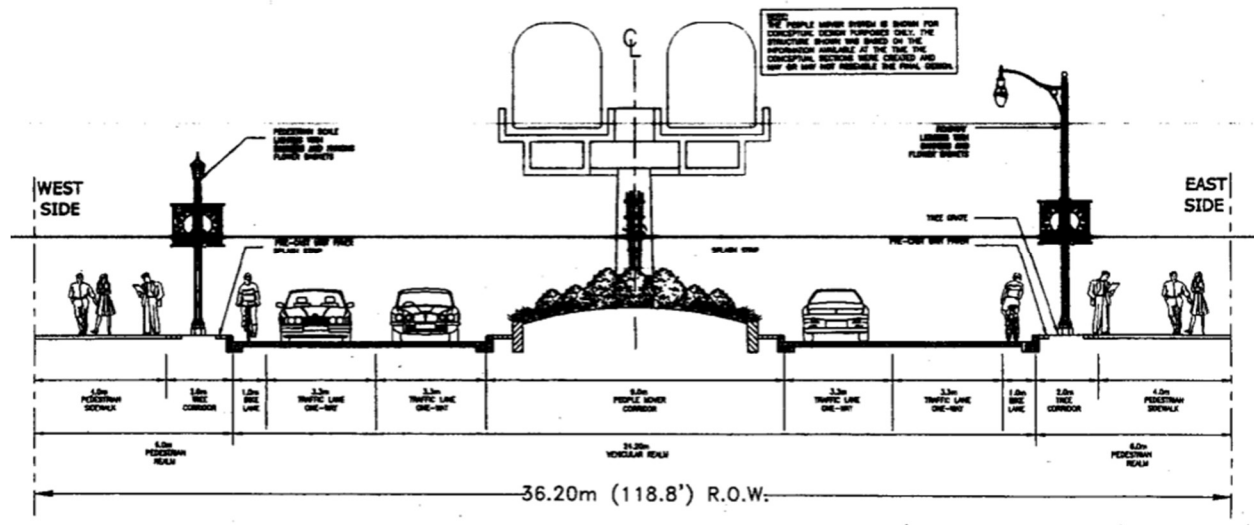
Section: Victoria Avenue - Grand Boulevard (Tourist District Streetscape Master Plan - Clifton Hill District)
